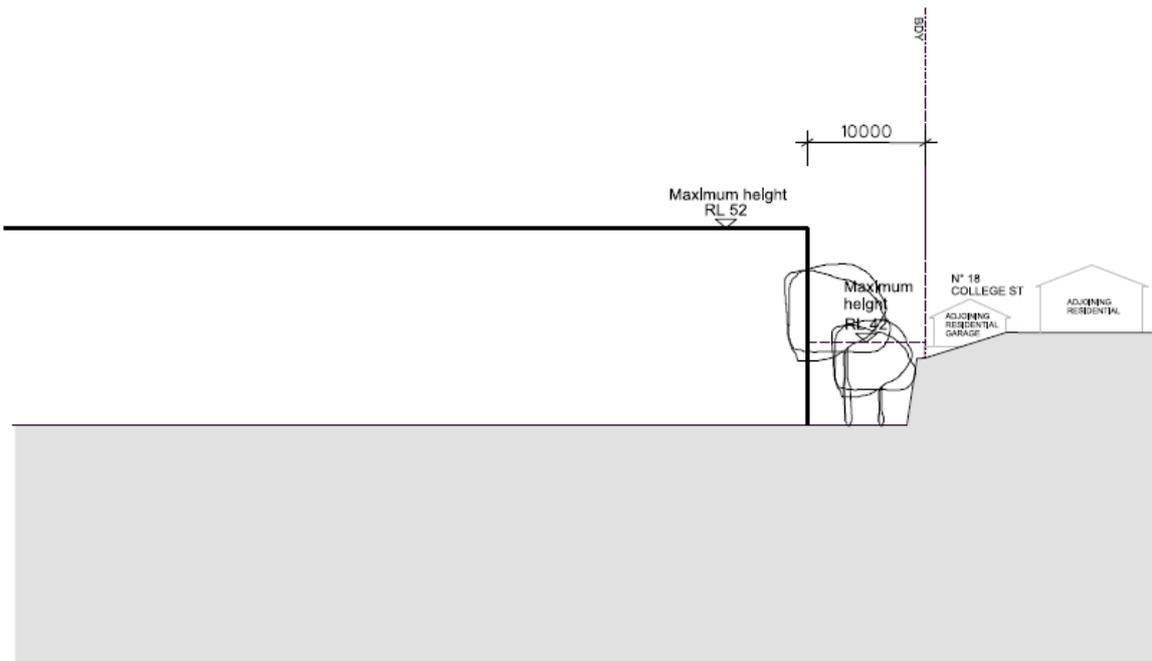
Section C Setbacks to neighbouring residential property at 18 College Street
